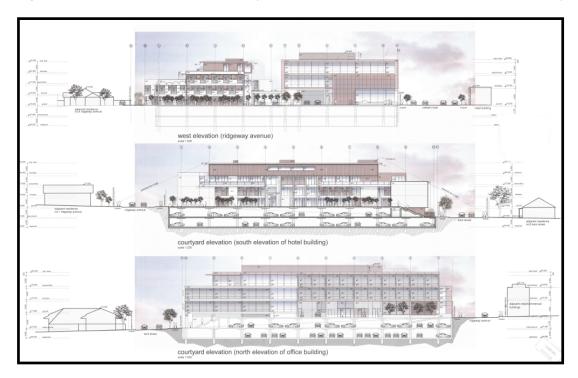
Endorsed Elevation Plans (Post12/00865 Endorsed on 10 December 2012)
